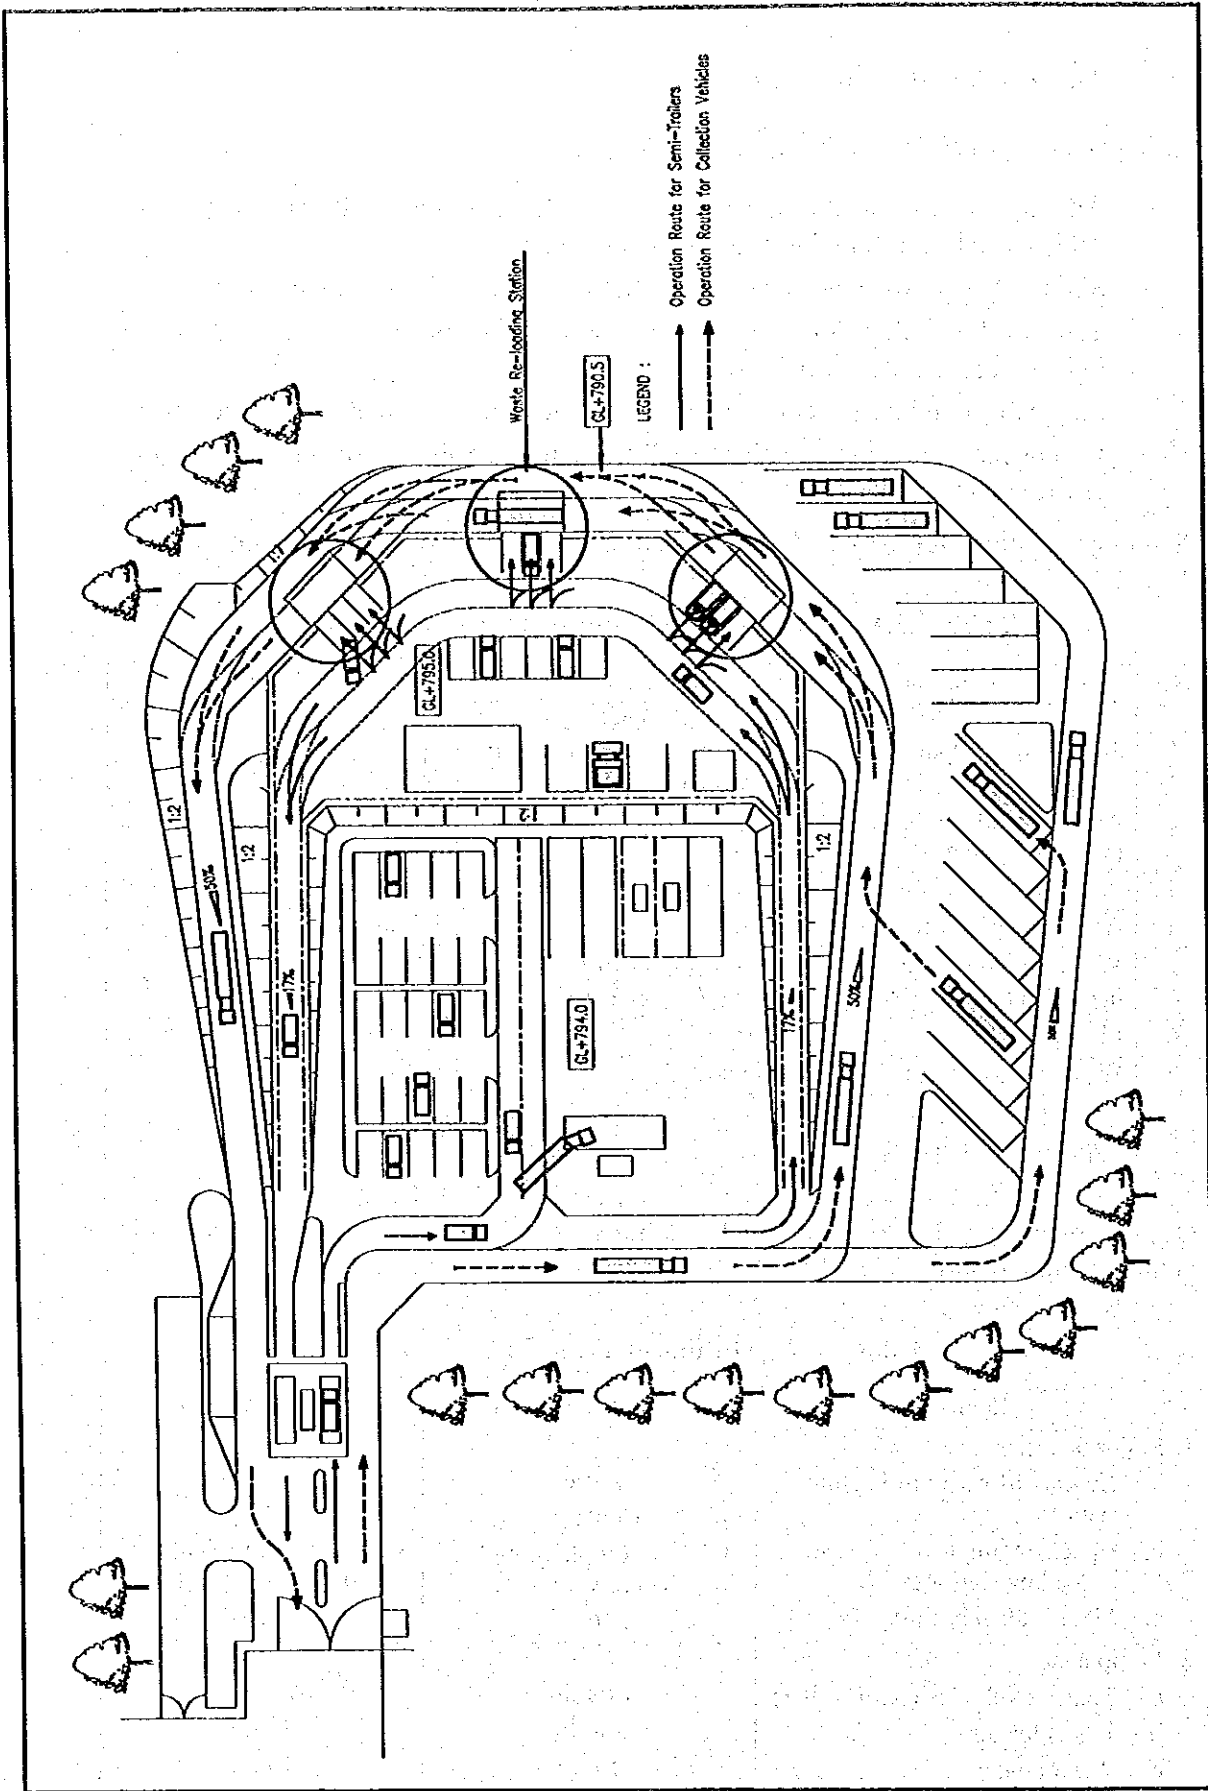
Layout and Vehicle Routing Plan of West Transfer Station
